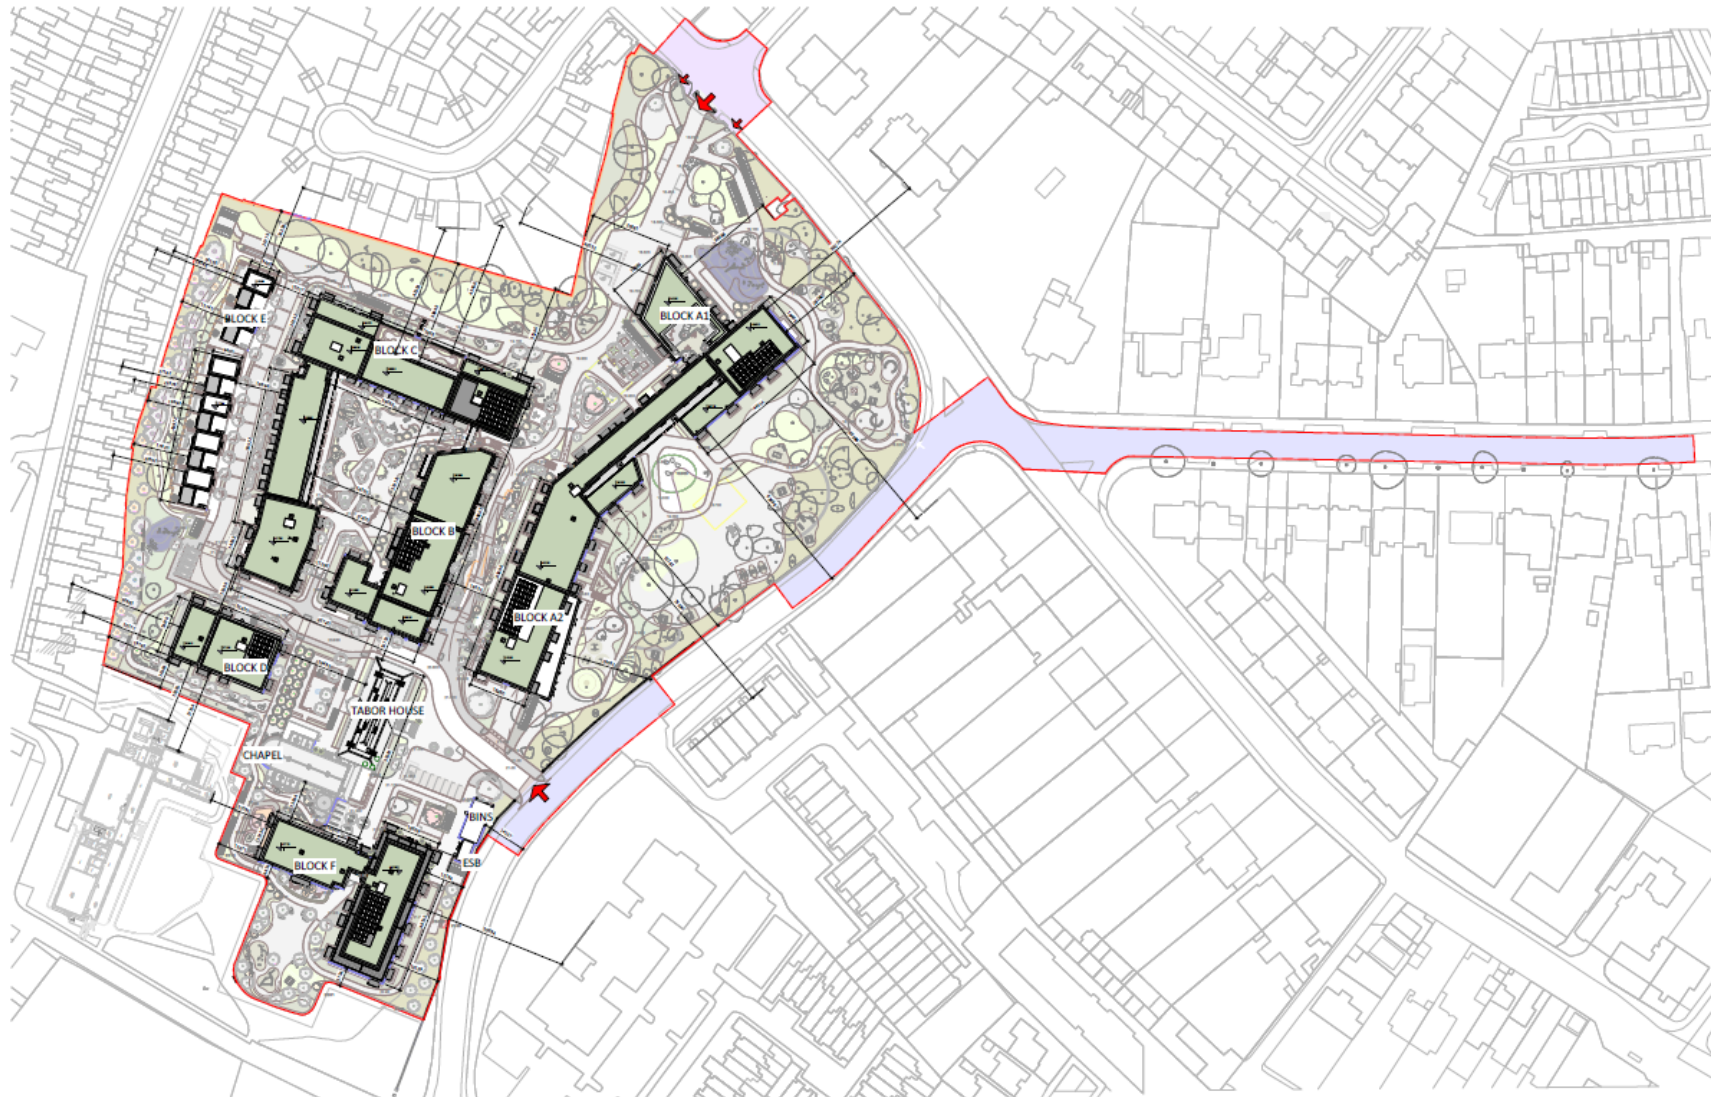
PROPOSED SITE LAYOUT (EXTRACTED FROM 19037C-OMP-OO-08-DR-A-1109 - PROPOSED SITE PLAN – ROOF LEVEL, 2025).
